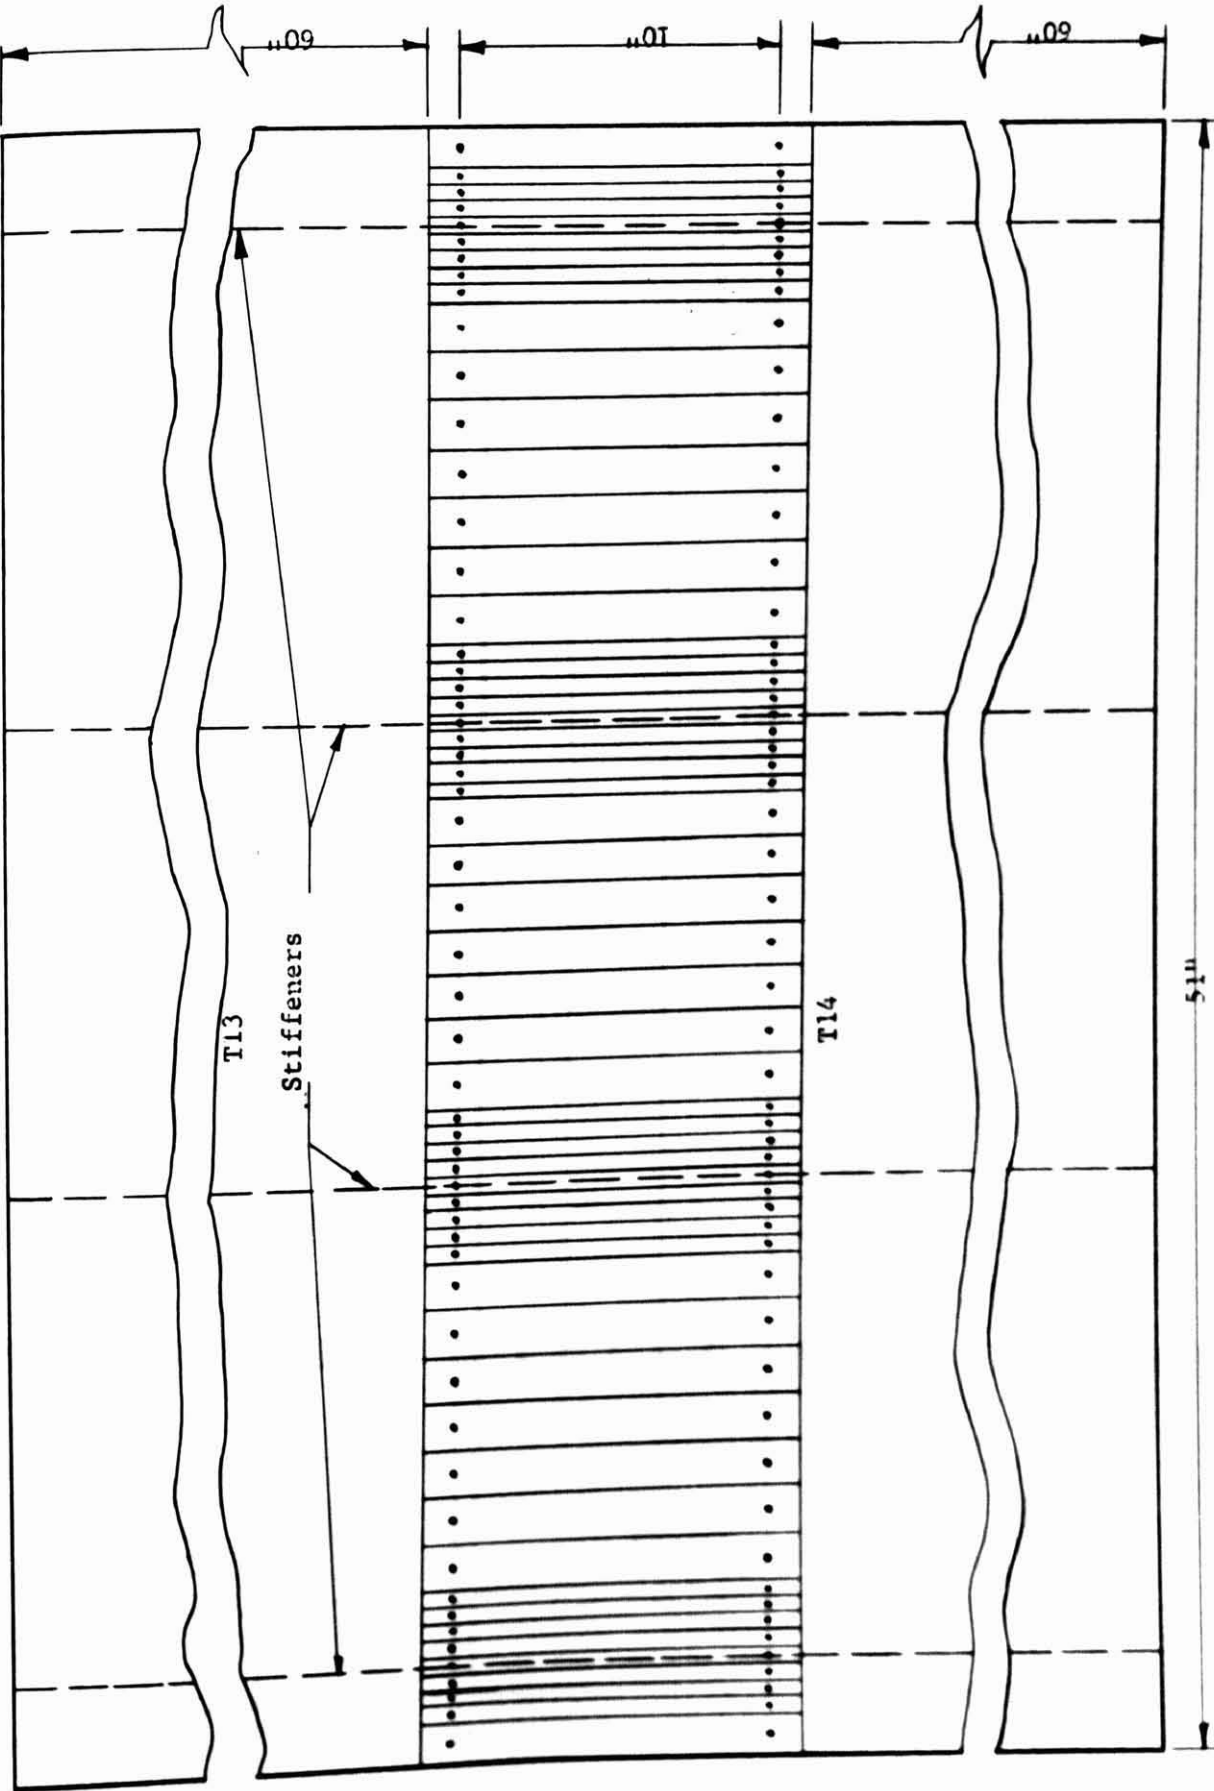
LOCATION OF GAGE HOLES FOR RESIDUAL
